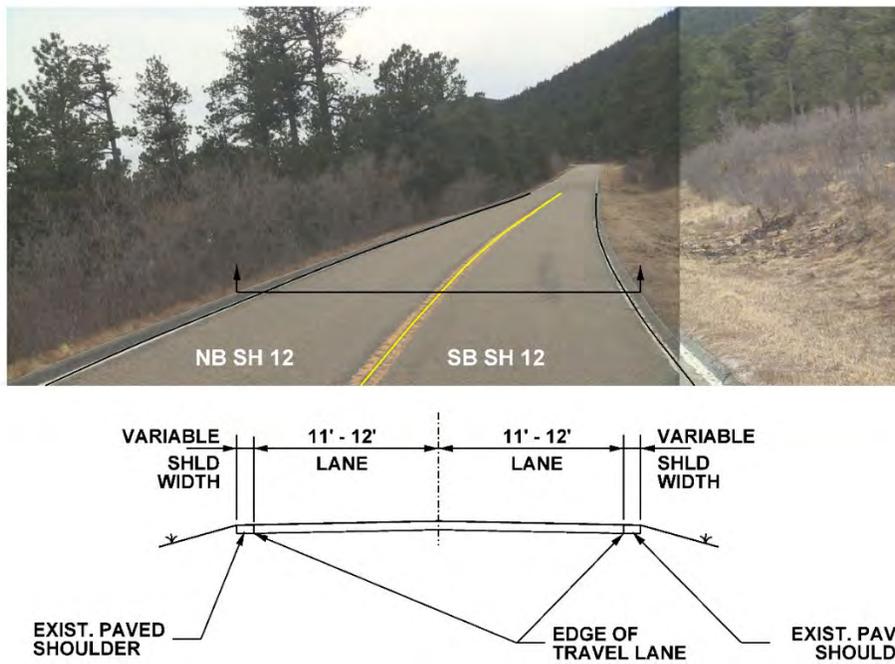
Mining Segment - SH 12 Typical Section Location Near MP 50
